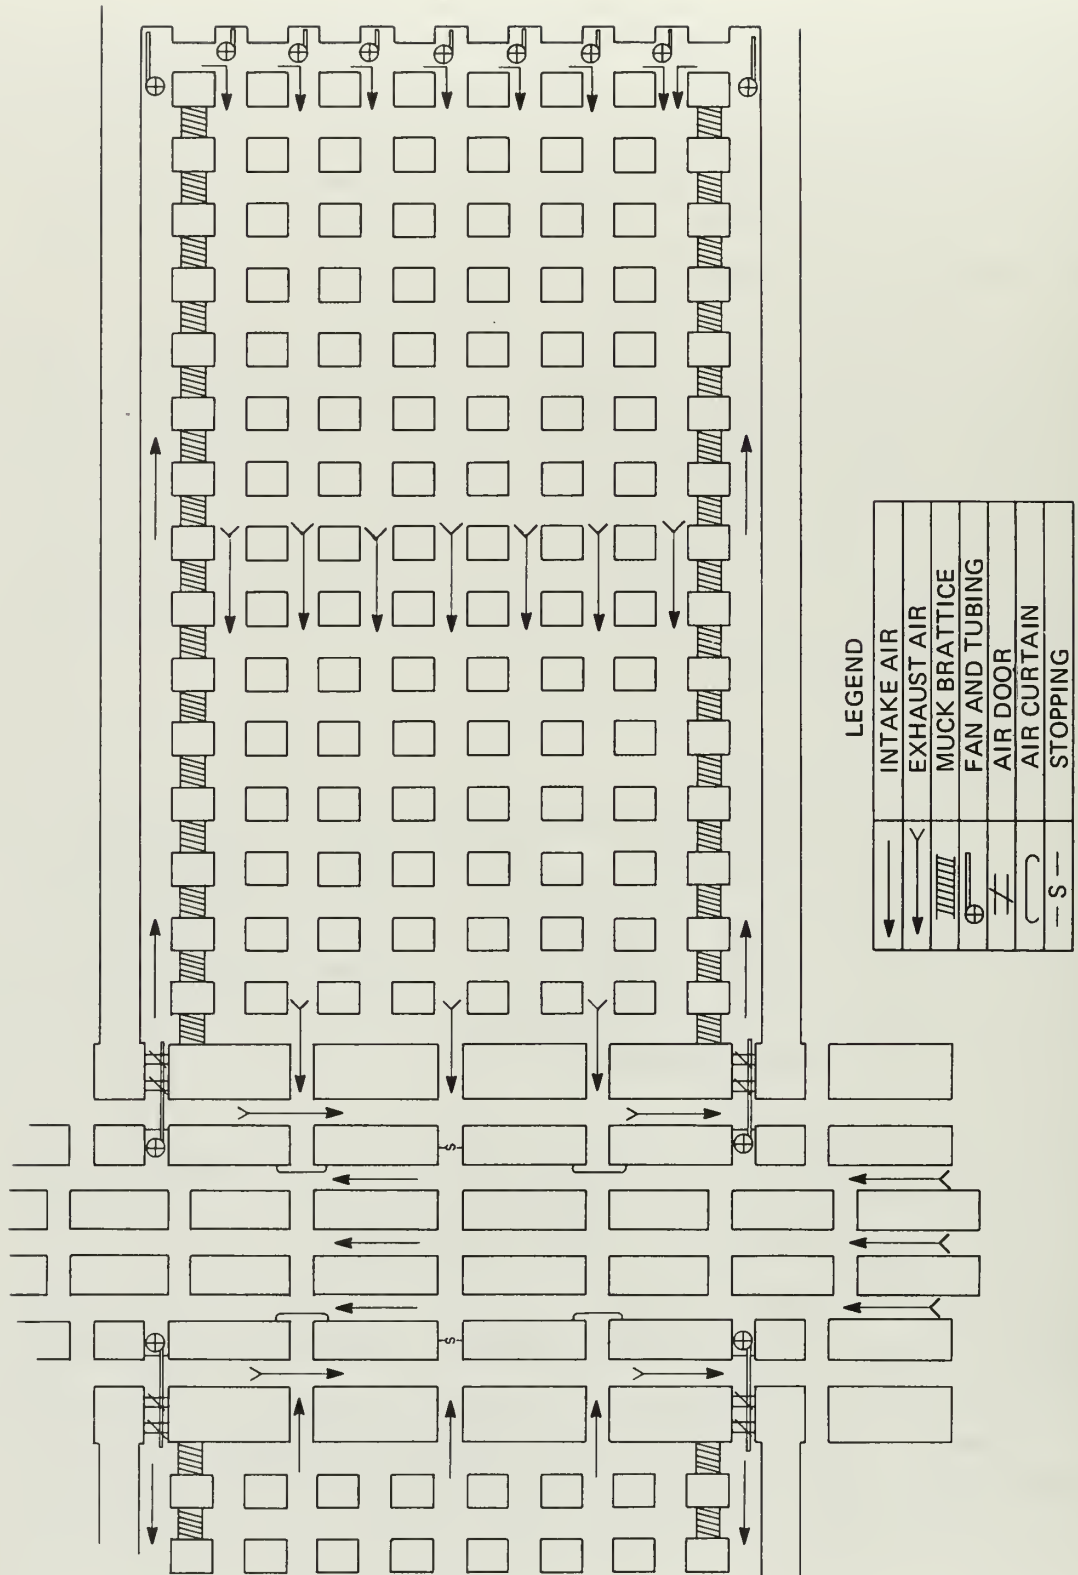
TYPICAL MINE PANEL VENTILATION PLAN
